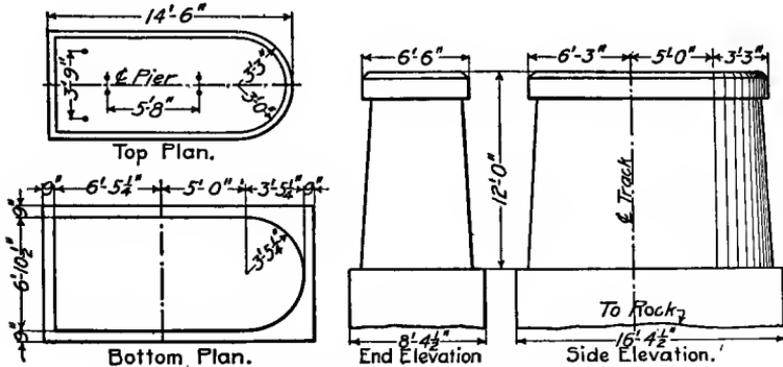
CONCRETE PIER. K.-C. M. & O. R.R.
